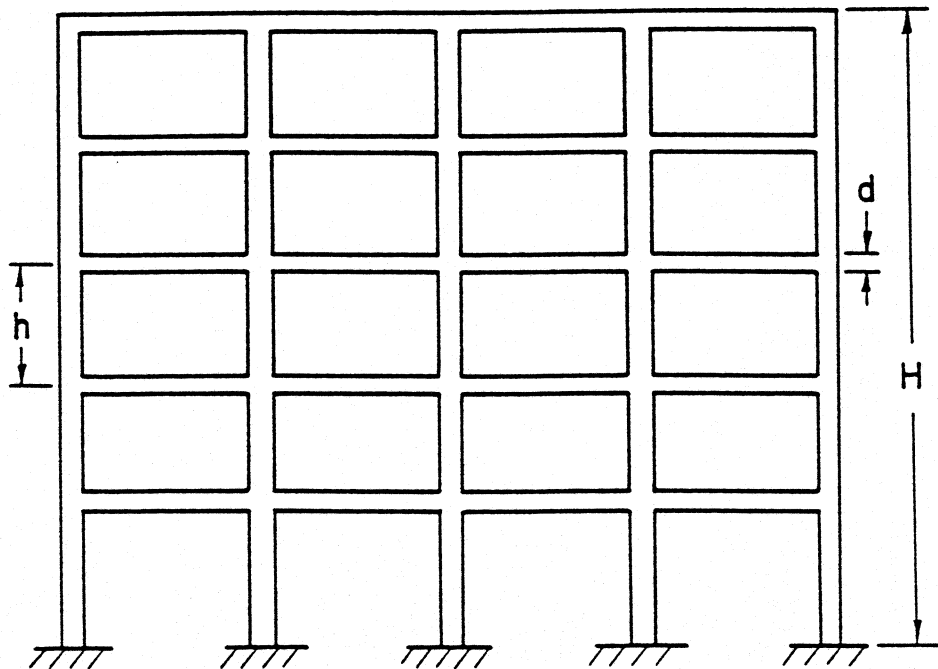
Moment resistant frame of a building. a) horizontal cross-section.
